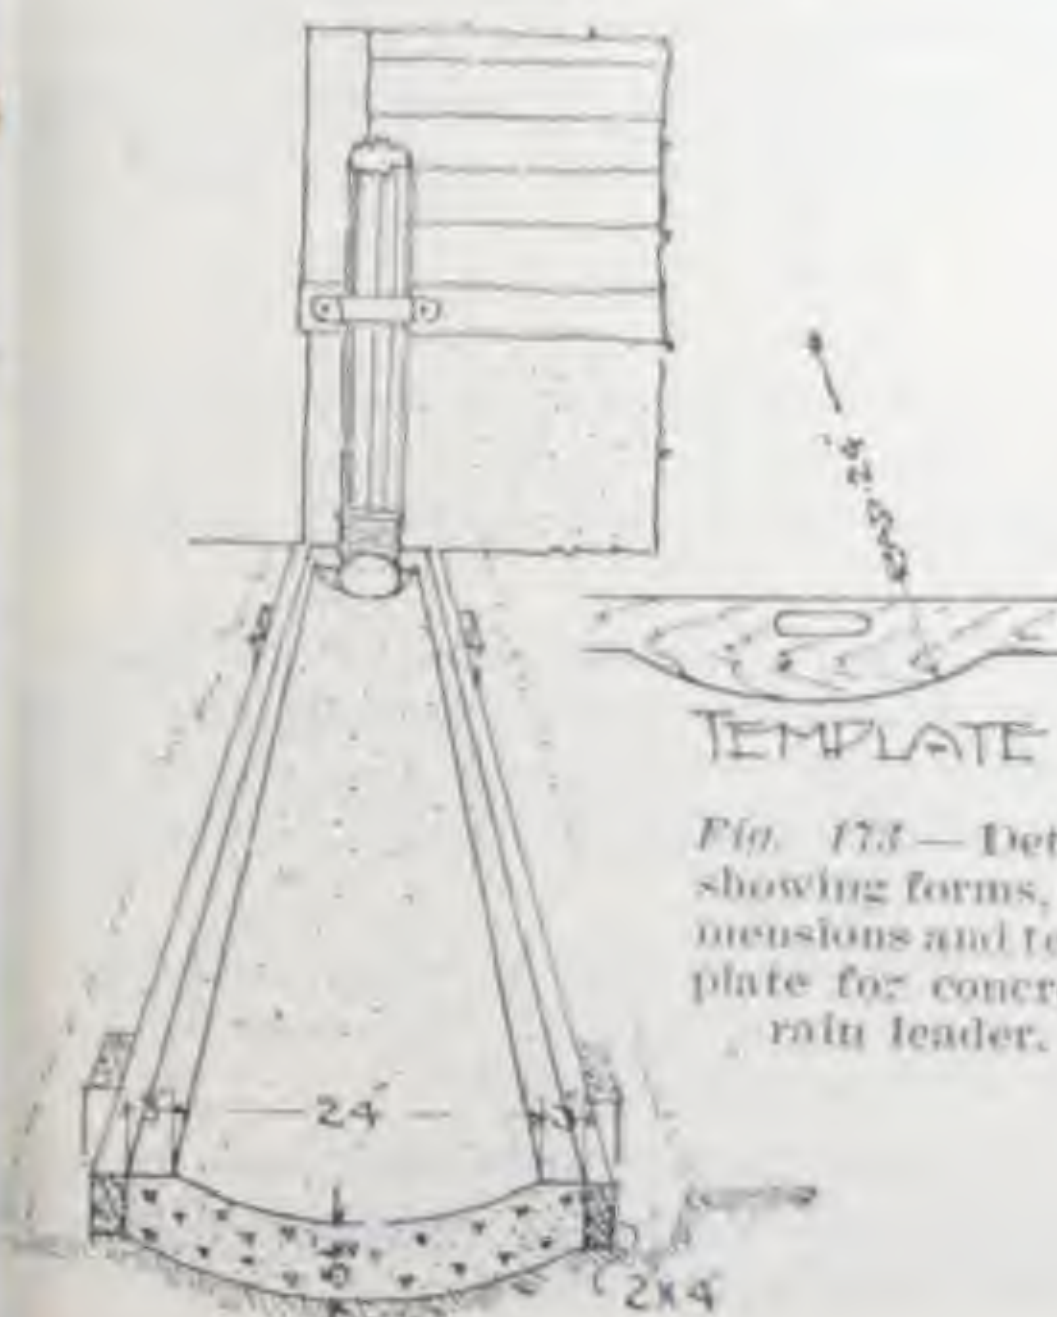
Detail showing forms, dimensions and template for concrete rain leader.
